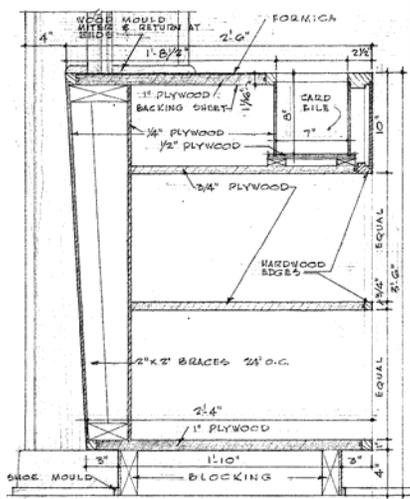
Original Construction Document, Desk Section Cut Detail [9]
